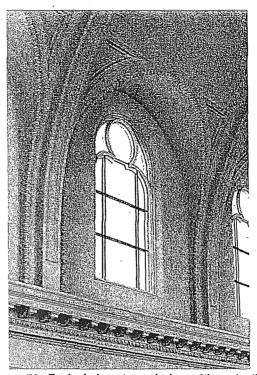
Typical clerestory window with protective glazing, interior view. (Rich Stapleton, 05/21/2018).
